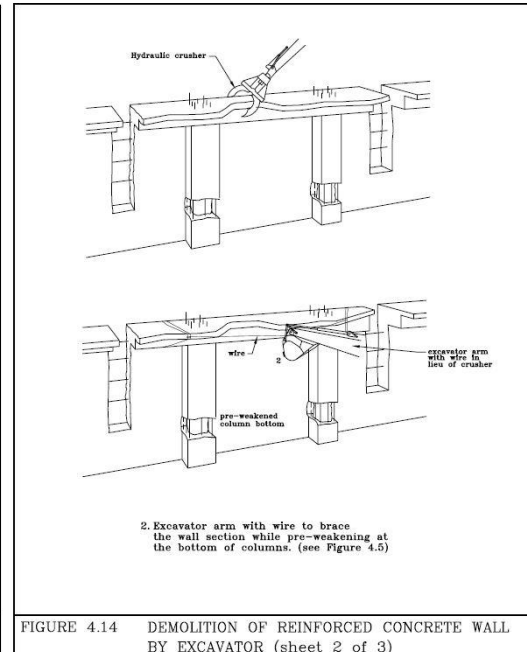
DEMOLITION OF REINFORCED CONCRETE WALL BY EXCAVATOR (sheet 2 of 3)
